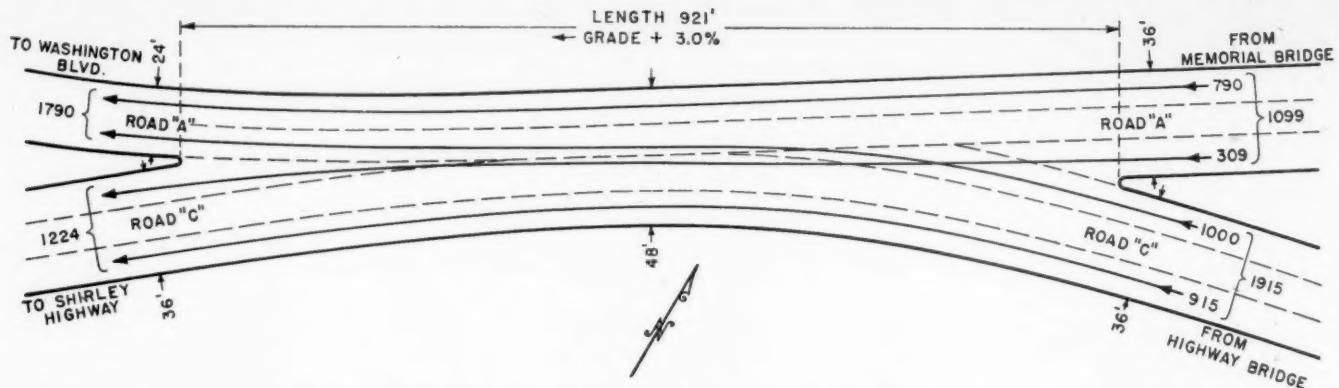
Maximum observed hourly traffic volume on mixing lanes for south-bound traffic at junction of road A from Memorial Bridge and road C from U S 1, Arlington, Va.
